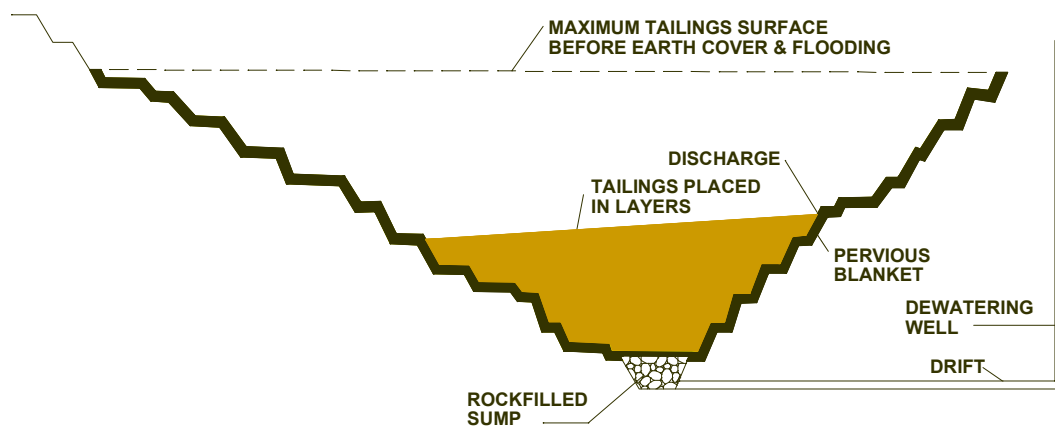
Cross section of Rabbit Lake pervious surround tailings management system.
